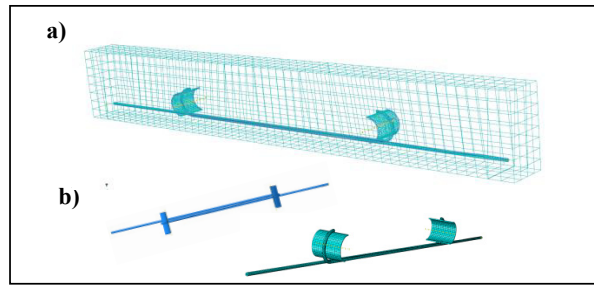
Finite element models: (a) geometrical and boundary conditions (b) Steel reinforcement.
